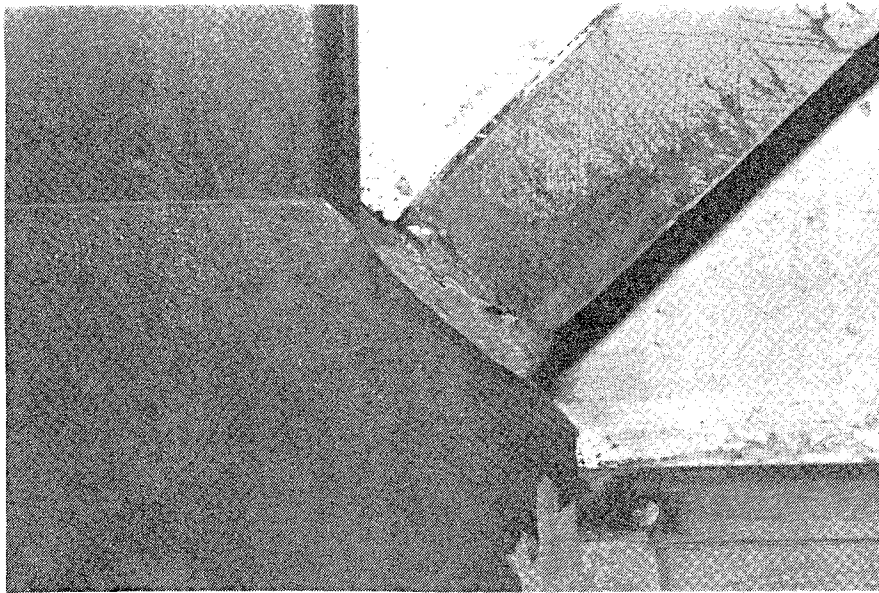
Weld failure at bottom of brace T1
